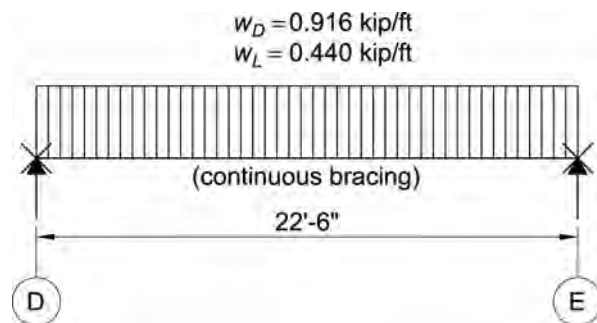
Loading and bracing diagram for typical north-south floor beams.
